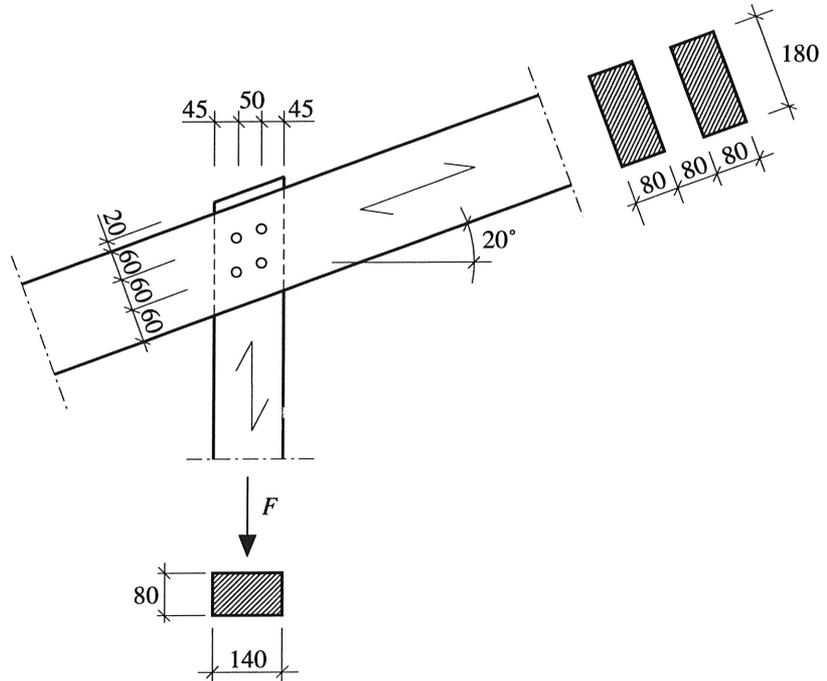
Double shear dowelled joint. Dimensions in (mm).
